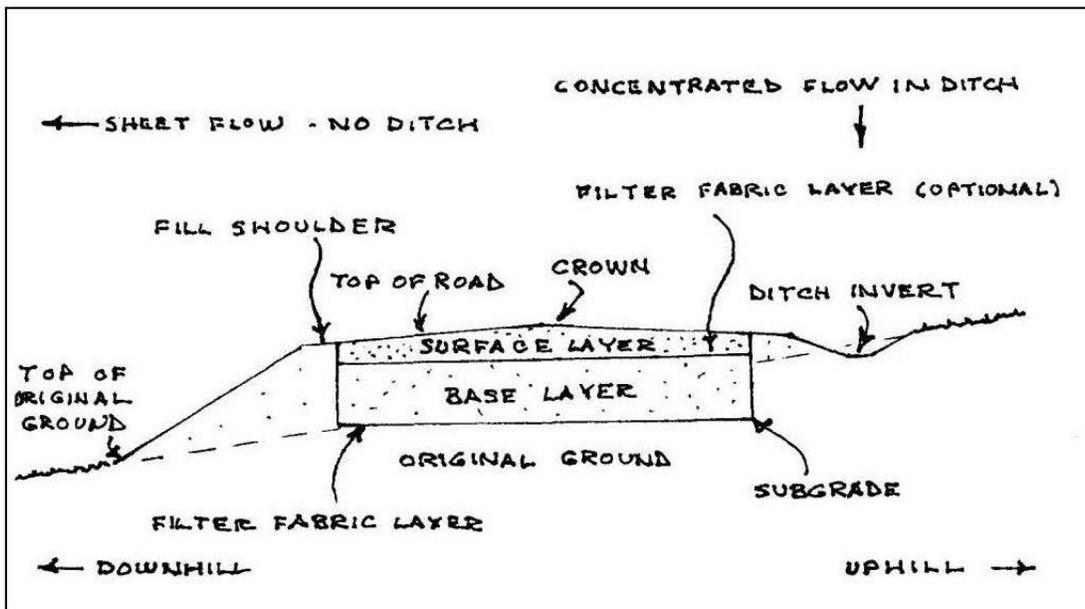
Typical Road Cross-Section – Canaan, NH Highway Department
